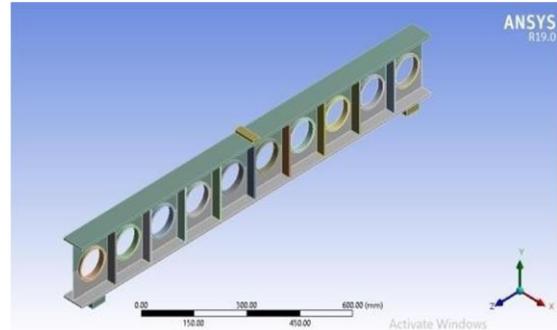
Strengthening with vertical stiffeners and ring stiffeners
